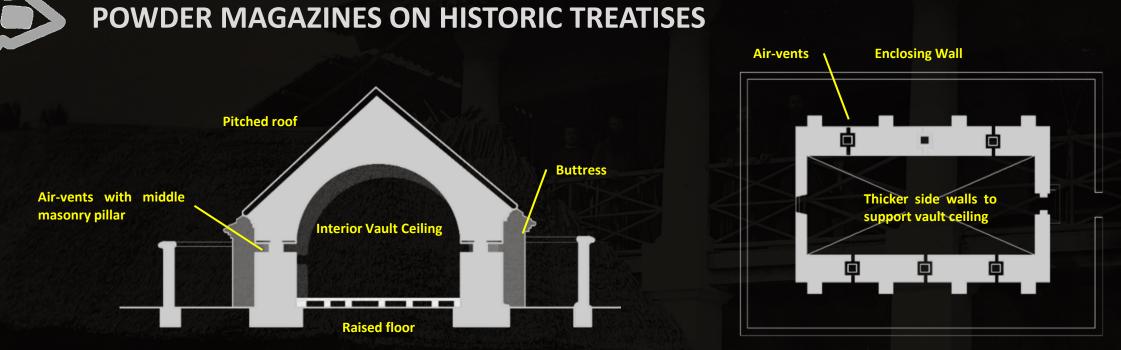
Section and plan of a powder magazine prototype by Vauban in 1693. Drawings by Angela Anchante, 2025
